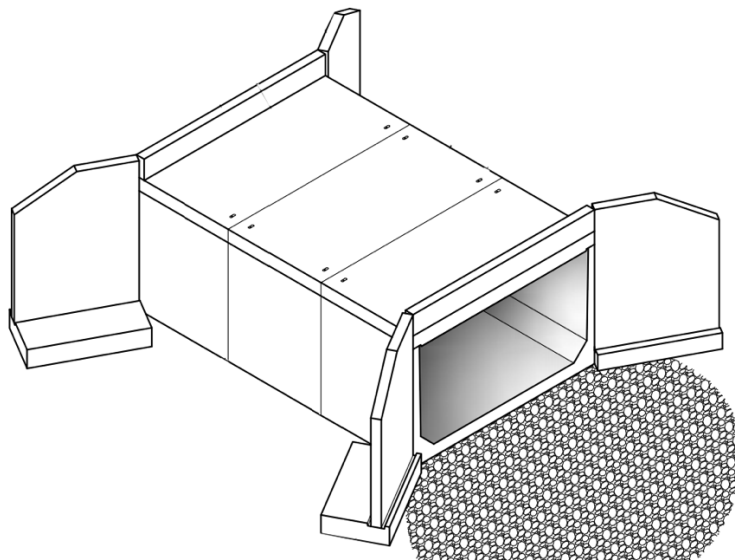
Three-Sided Bridge- Inverted Installation.* (CPP, n.d.)
